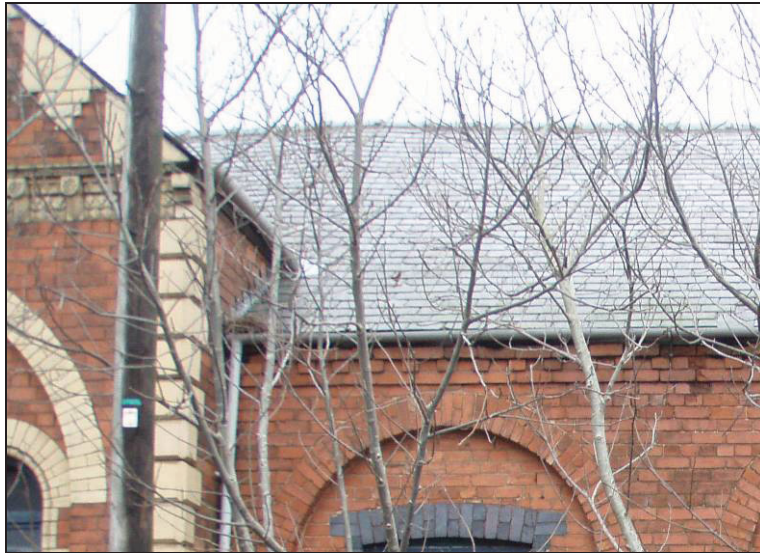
Rise in the roof line between the chapel and the schoolhouse depicting the area where the two buildings have been joined.
